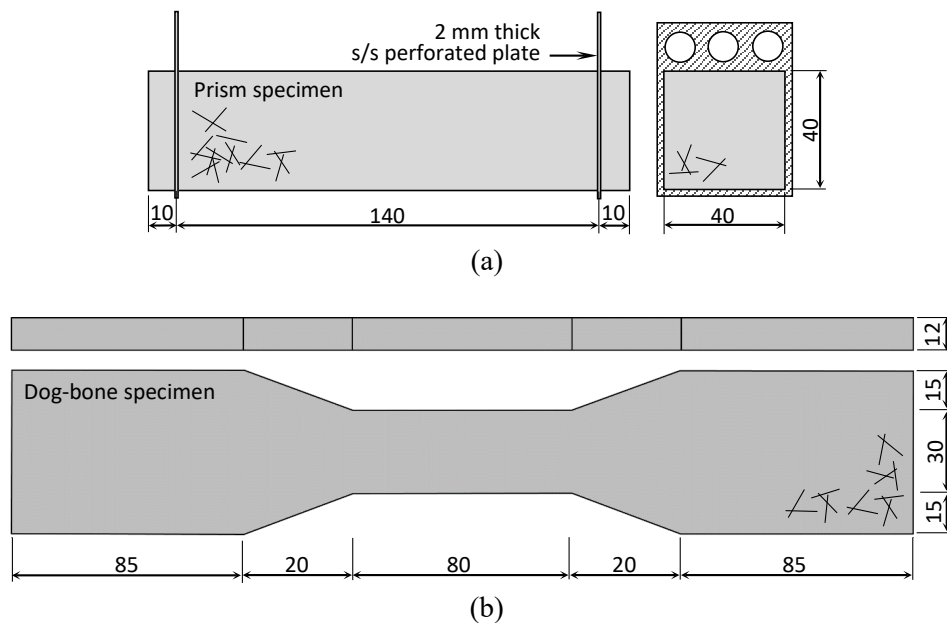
Schematic of test specimens: (a) prism; and (b) dog-bone shaped (DB) specimen. All dimensions are in mm.
